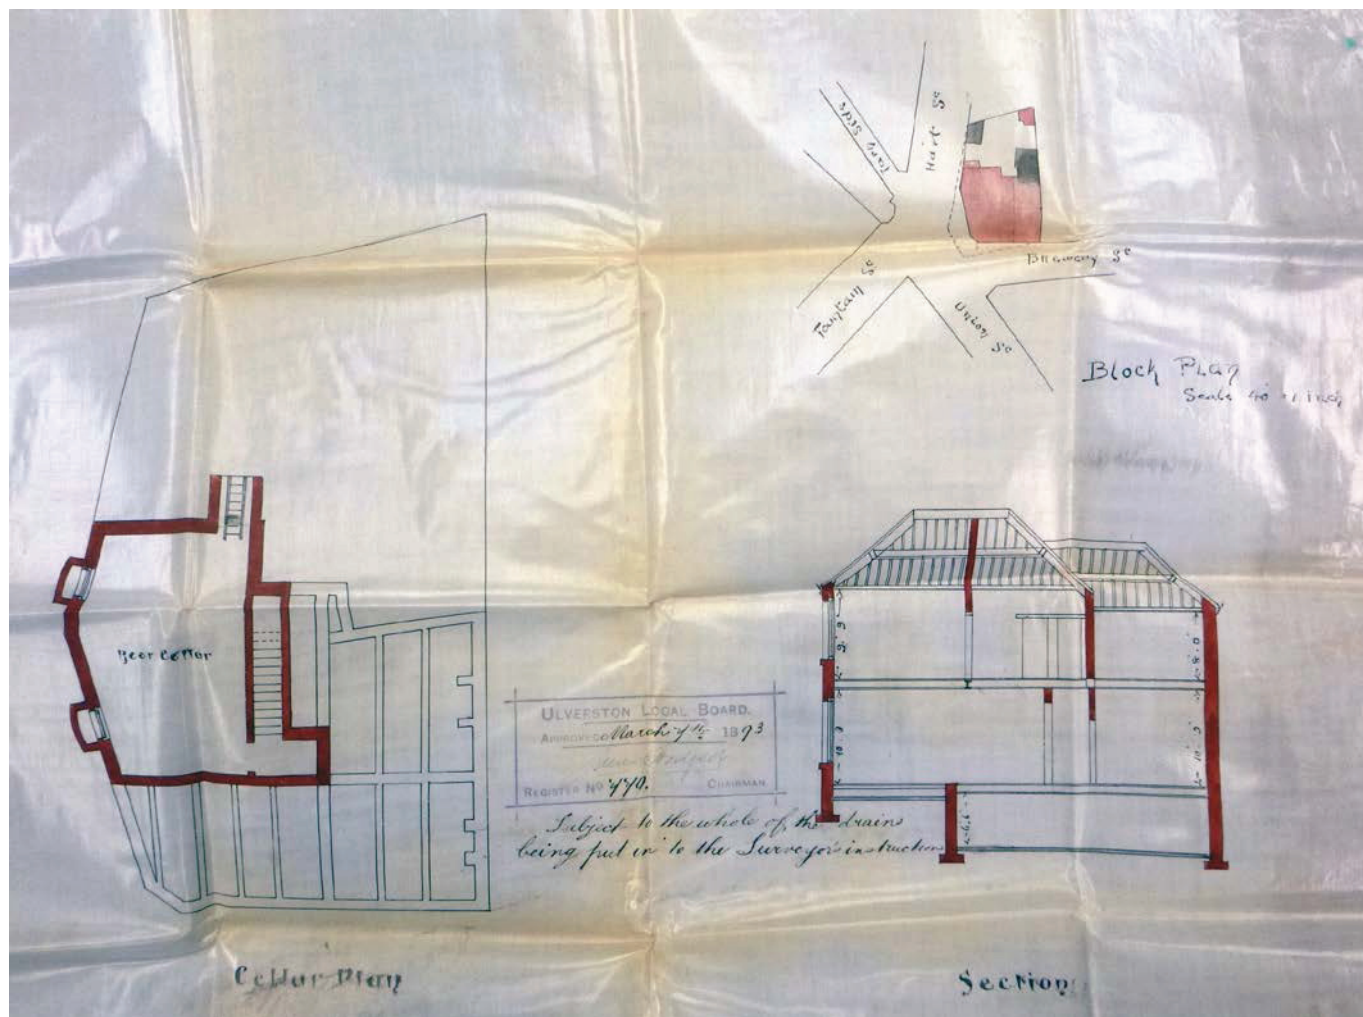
Cellar plan, block plan, and section of proposed alterations, 1893 (north is to the left)
